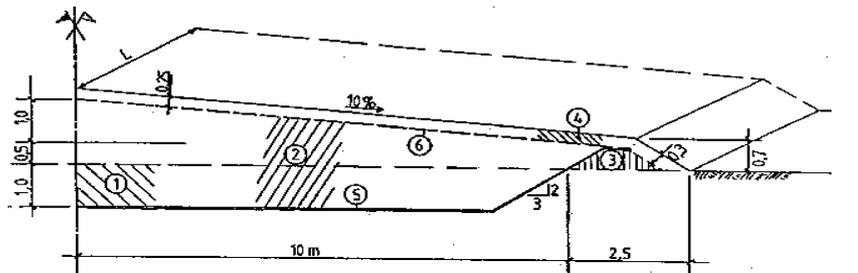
Schematic drawing of stockpiling (A,B₁ measure)
